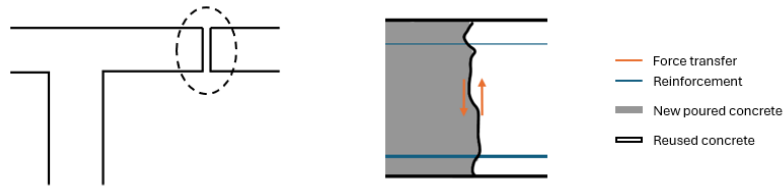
Schematic representation of a reconnection of a T-shaped column and a beam
